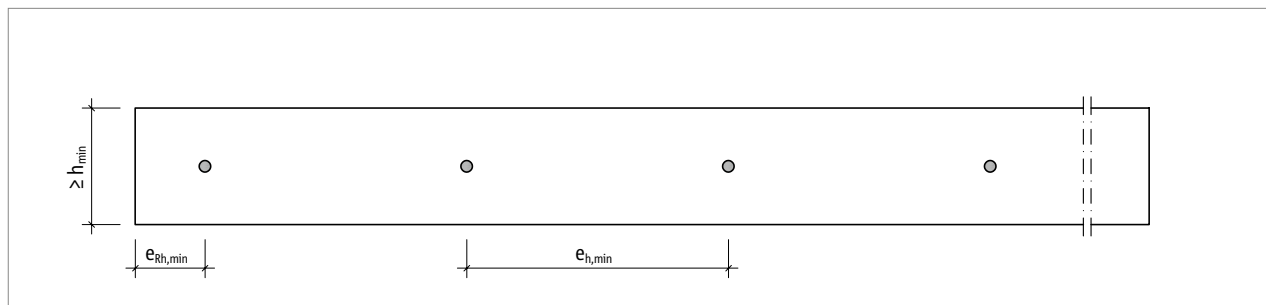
Schöck Stacon® type LD: Minimum structural component measurements and dowel spacings with one slab
